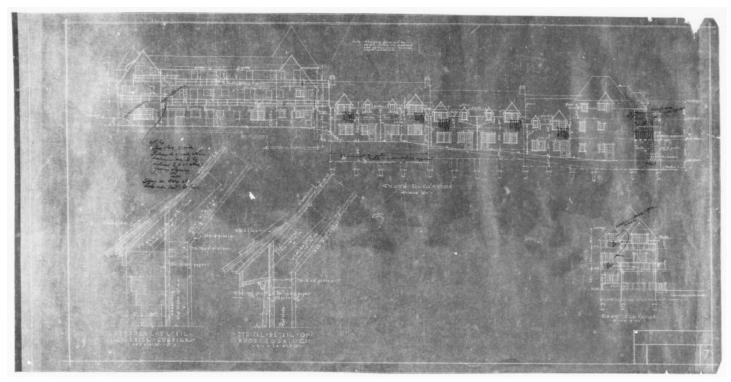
Beauville, South Elevations & East Elevation – 1928 (7 of 7)
